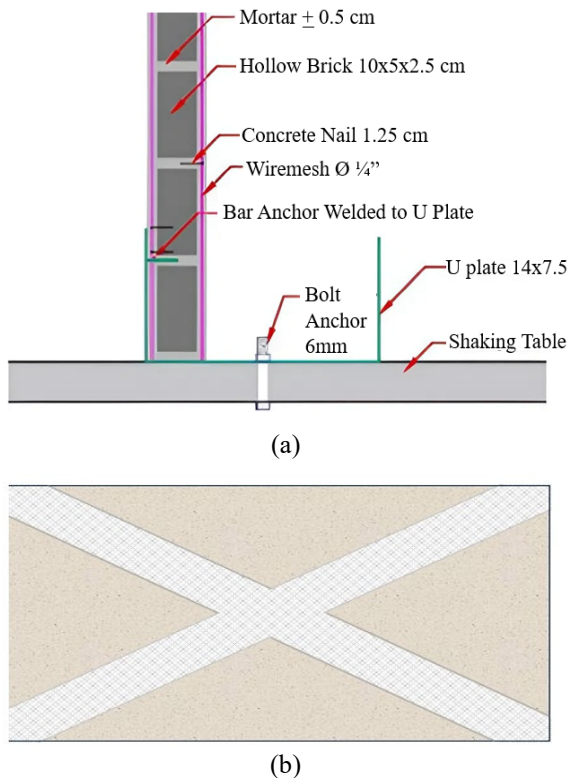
Details of the wall of the house model, and Installation of the ferrocement layer of the cross system on the wall of the house
